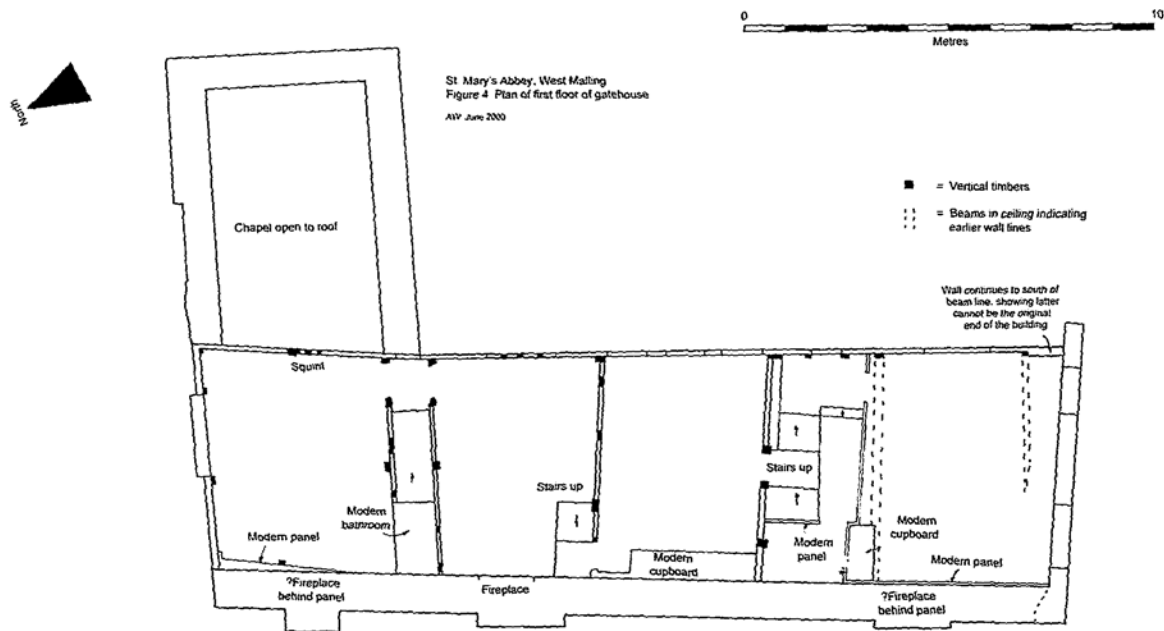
St Mary's Abbey Gatehouse: plan of first floor.
